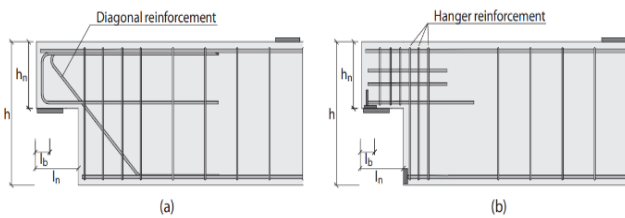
(a) Diagonal reinforcement layout (b) Orthogonal reinforcement layout
